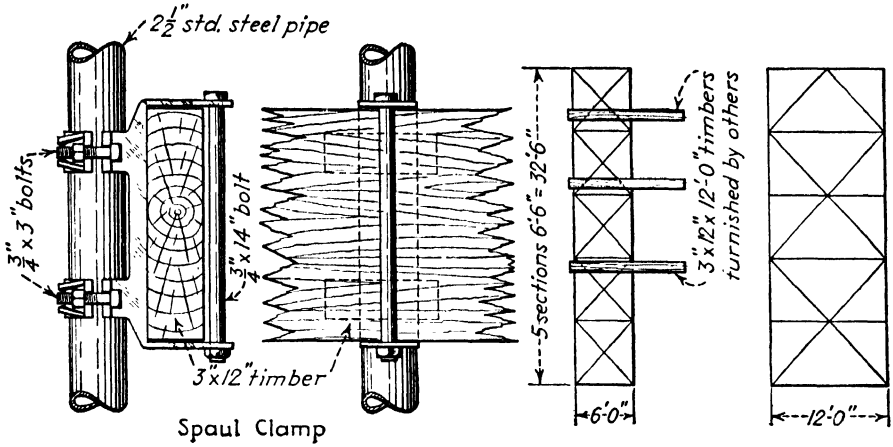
Spaul clamp for 3- by 12-in. timber spaul. (Courtesy of Dravo Corp.)
